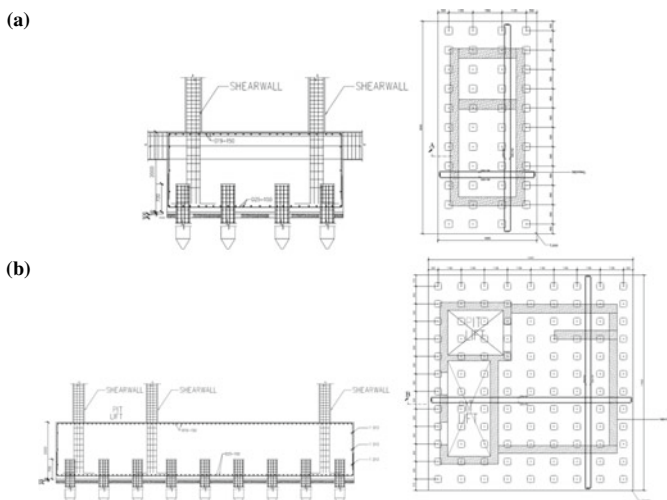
Type of pile cap model a pile cap with 5 element pier 44 piles, b pile cap with 11 element piers with 108 piles
